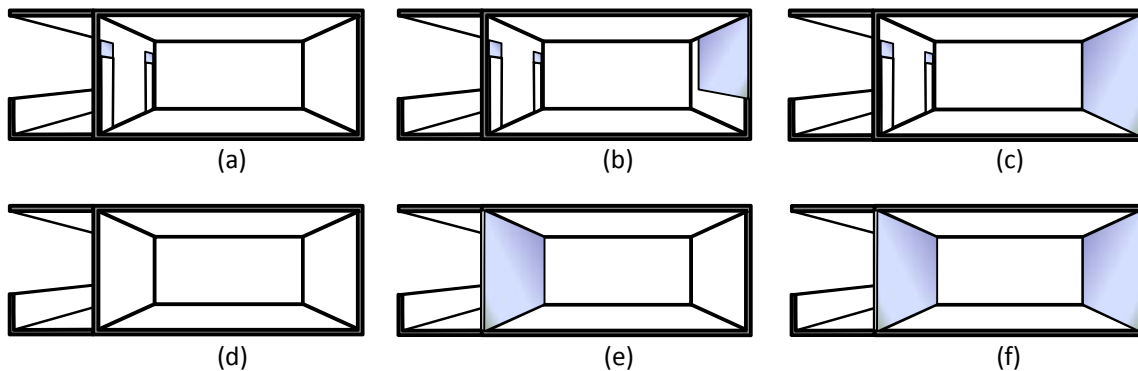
4 Window area cases: (a) without window, (b) existing window, (c) fully glazed wall, (d) opaque walls, (e) fully glazed wall at the corridor side, and (f) two opposite fully glazed walls.
